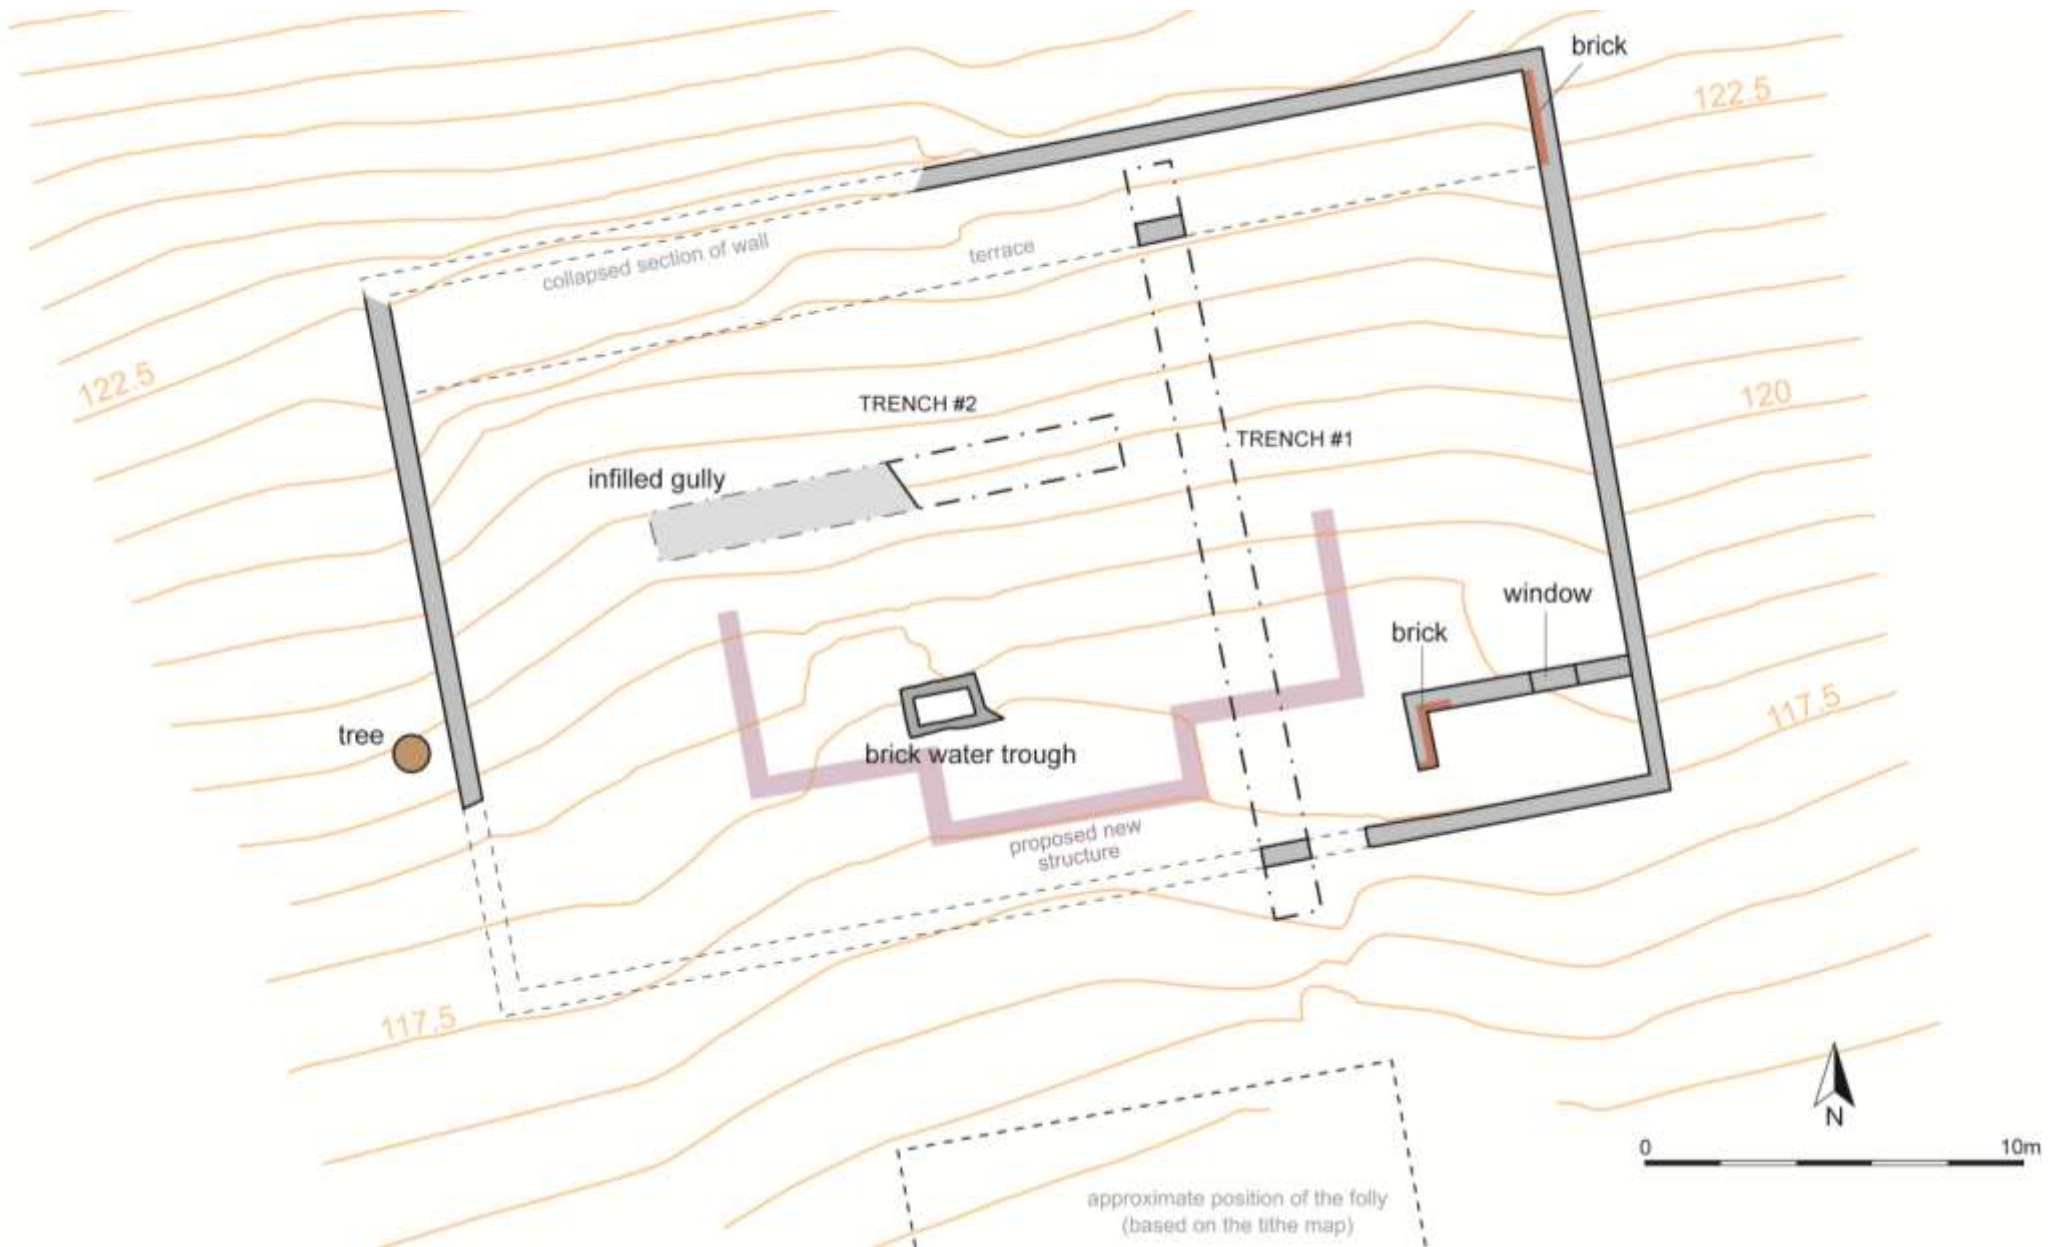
Plan of the walls and the location of the evaluation trenches (measured plan supplied by the architect).
